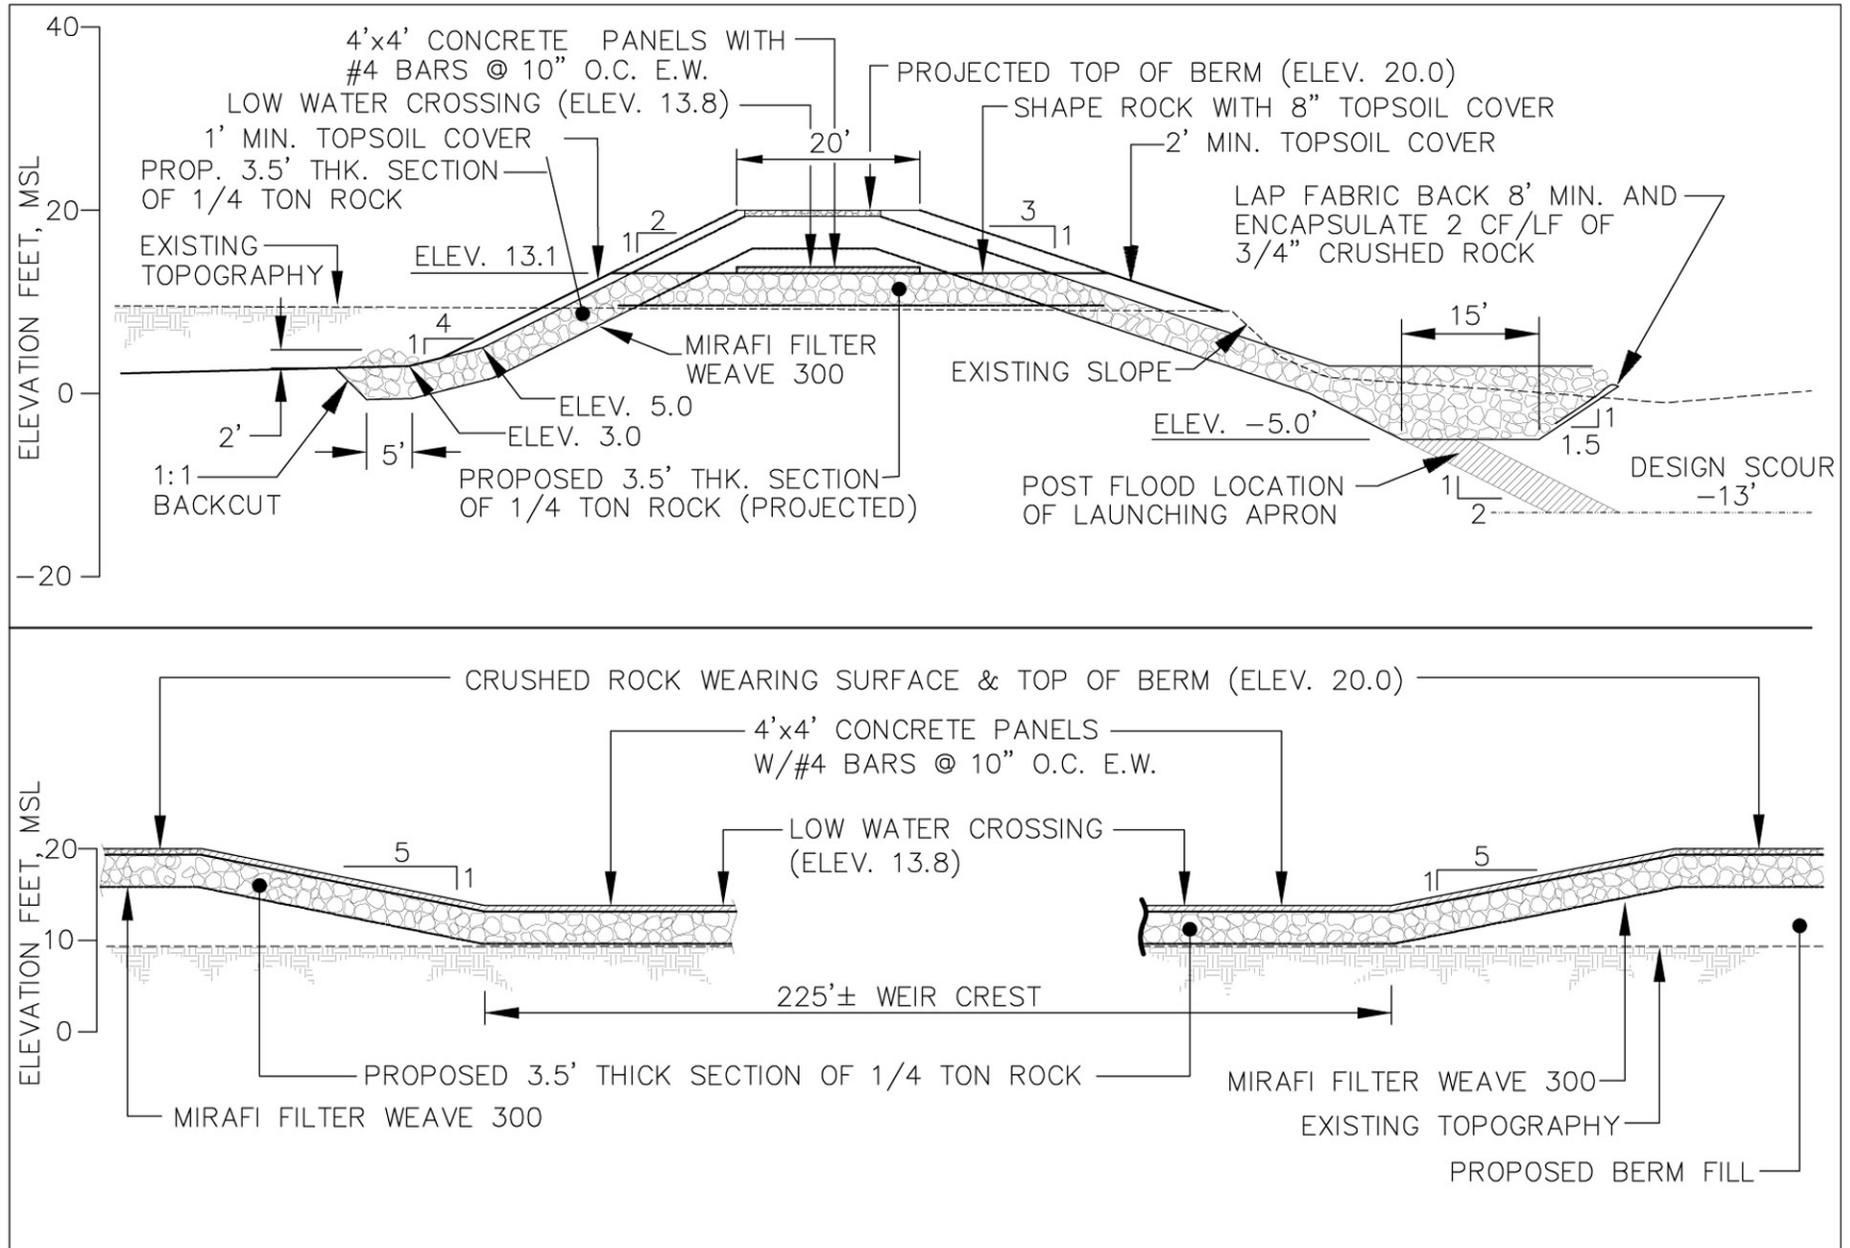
Typical Section Rock Slope Protection Through Upstream Weir Section
